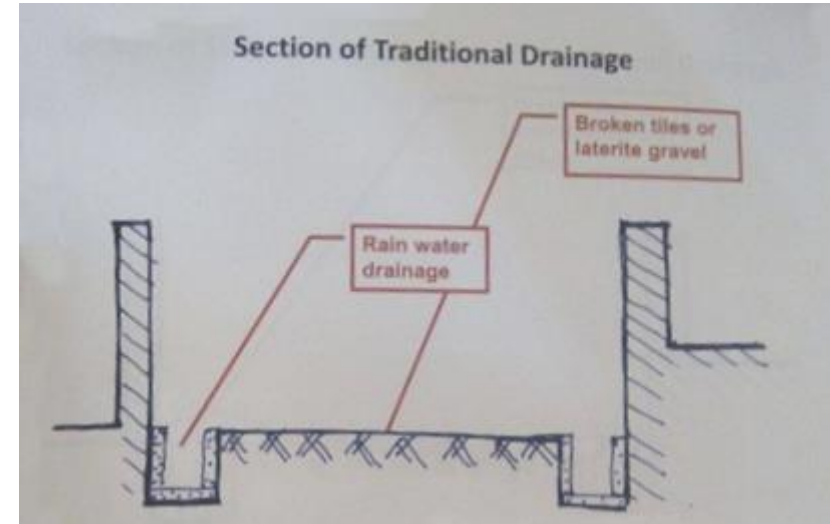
Section of Traditional Drainage (Revive Chettinad Heritage Campaign document)
